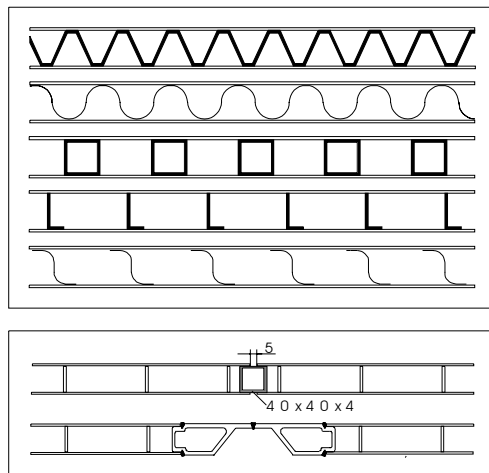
Examples of possible core and joint solutions for steel sandwich panels
